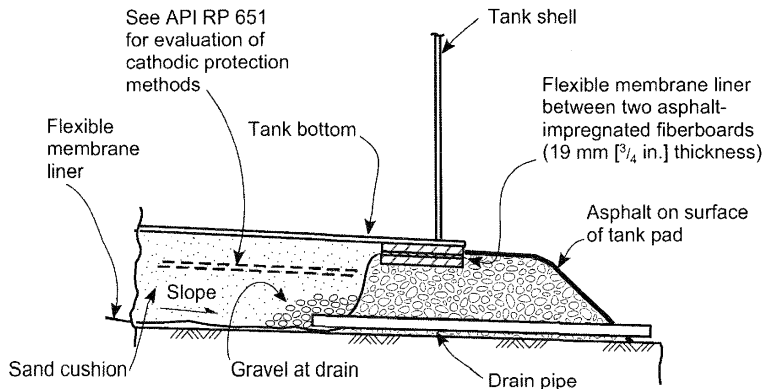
Earthen Foundation with Undertank Leak Detection at the Tank Perimeter (Typical Arrangement)
